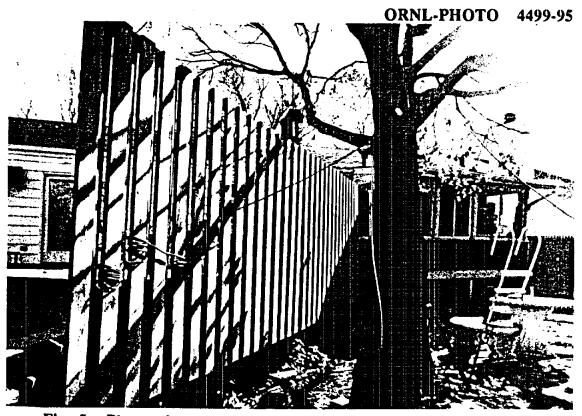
Photo of the back yard facing the southwest end of the house at 1 Shady Lane, Lodi, New Jersey.
